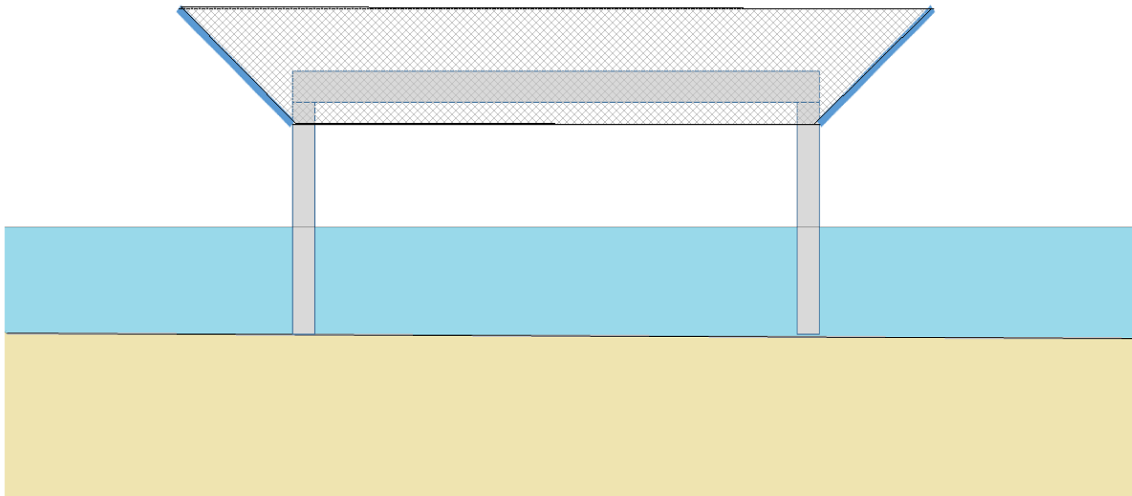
T-1: Elevation Illustration of Mesh Mechanism To be Deployed Below Base Of Overwater Bar Superstructure To Trap Falling Debris.
